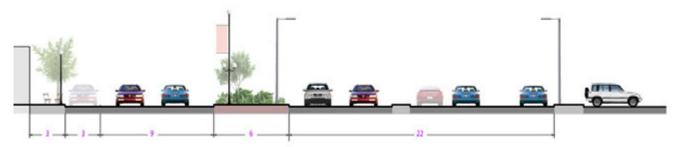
Avenue A South Street Section to Idylwyld Drive
